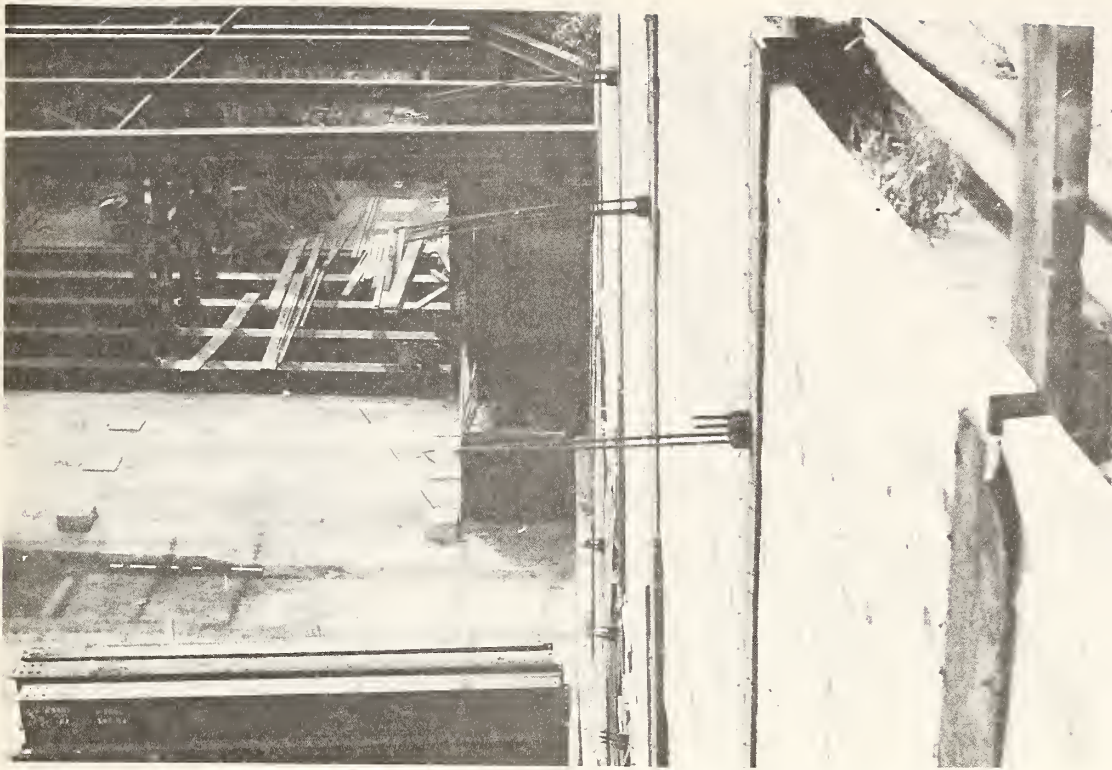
Open cut construction with both strut bracing and tieback anchorages.
